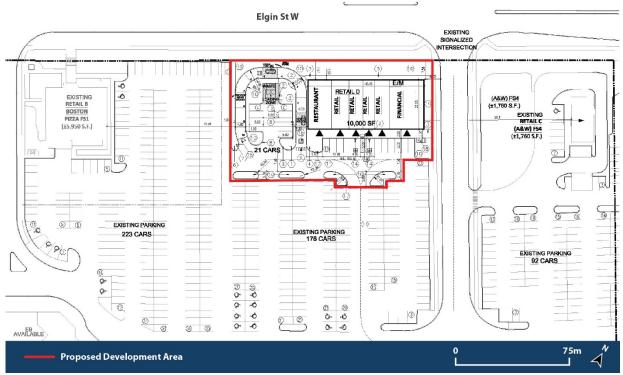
Site Plan of Proposed Developed Area by Petroff Partnership Architects.
